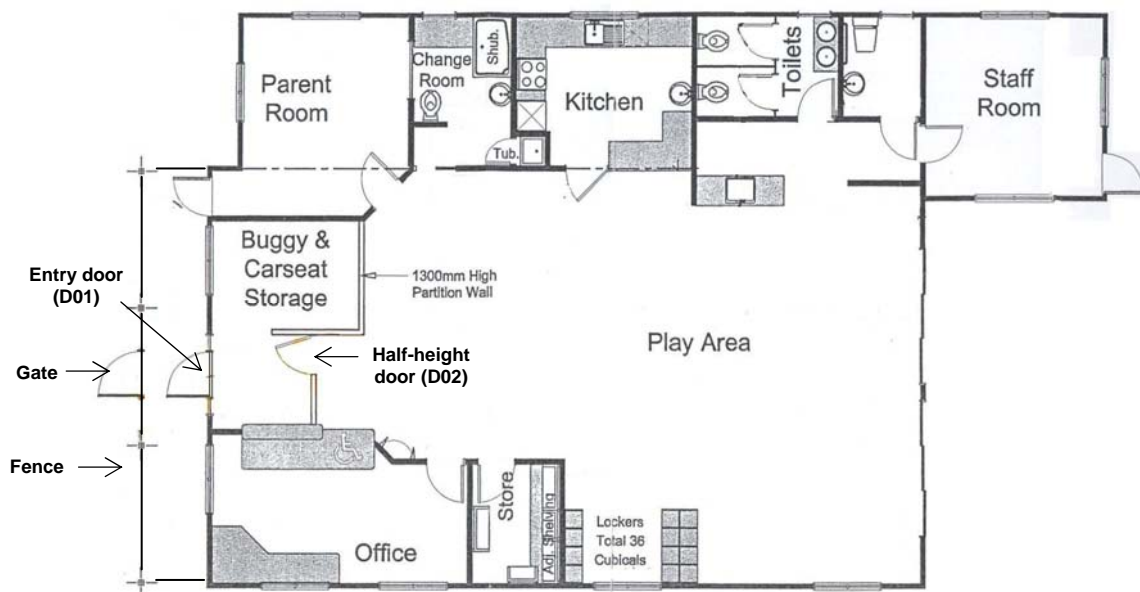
Revised floor plan showing the gate and doors D01 and D02
